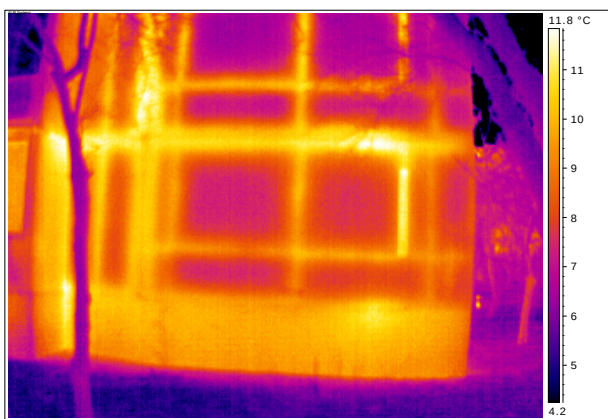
Large panel wall – plates insulation (mineral wool, polystyrene)
